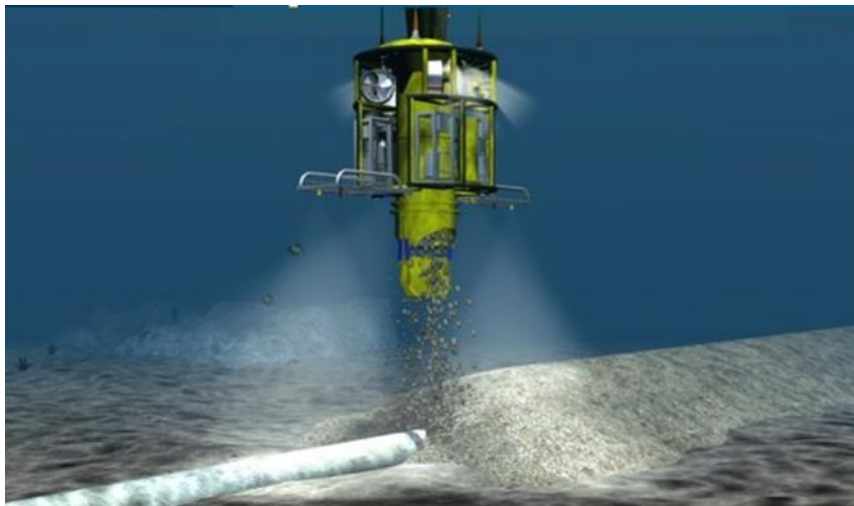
Visualisation of a rock berm construction [Source: offshore-fleet.com]
